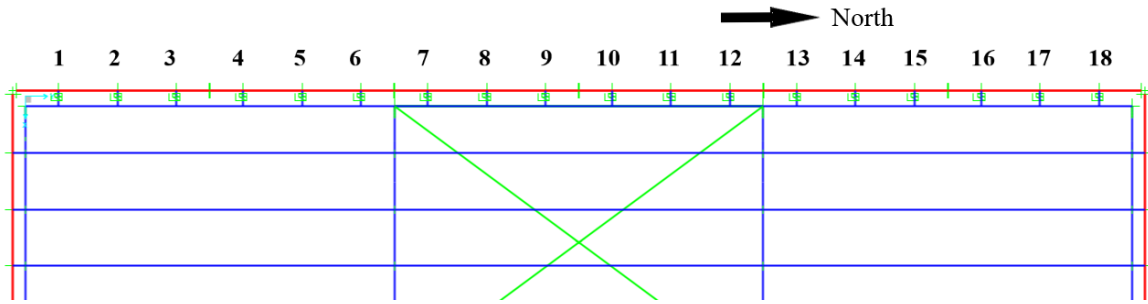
West Wall RFC Identification (Model 85 Plan View)
